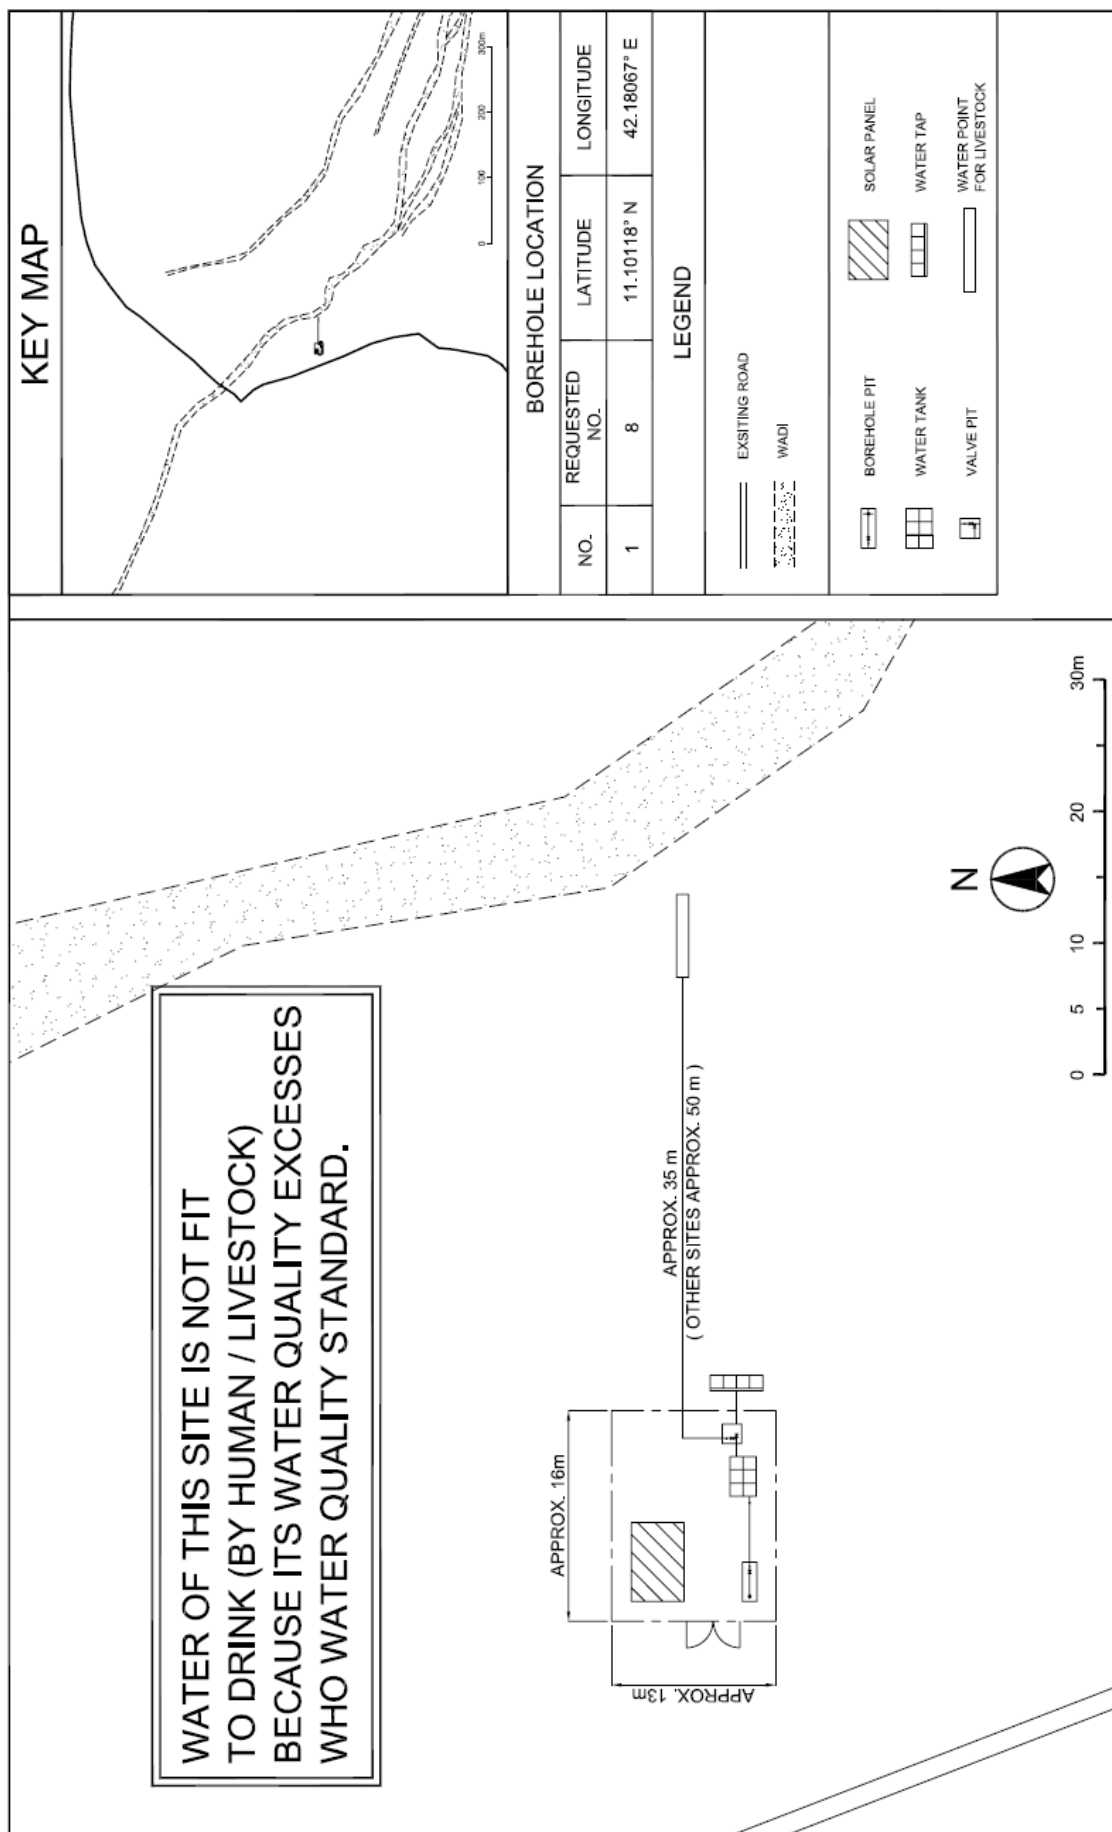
Layout of Facility (2) [Zina Male]
